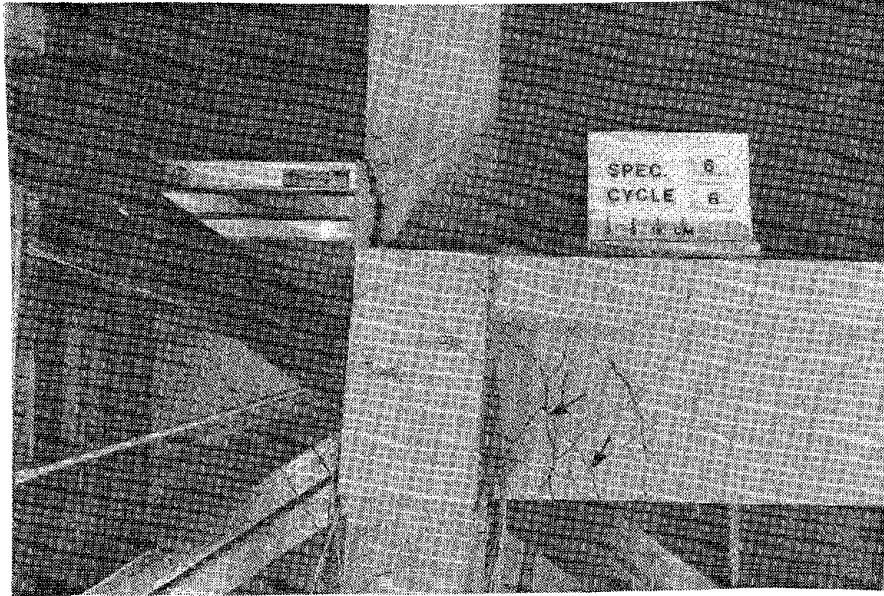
Opening of the Beam Flexural Cracks Near the Column in Specimen 6.
